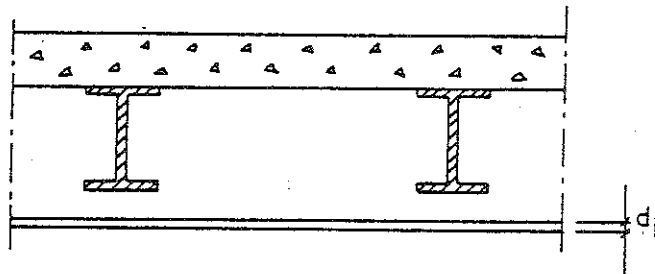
Floor structure, composed of a reinforced concrete slab, load-bearing steel beams, and an insulating ceiling
